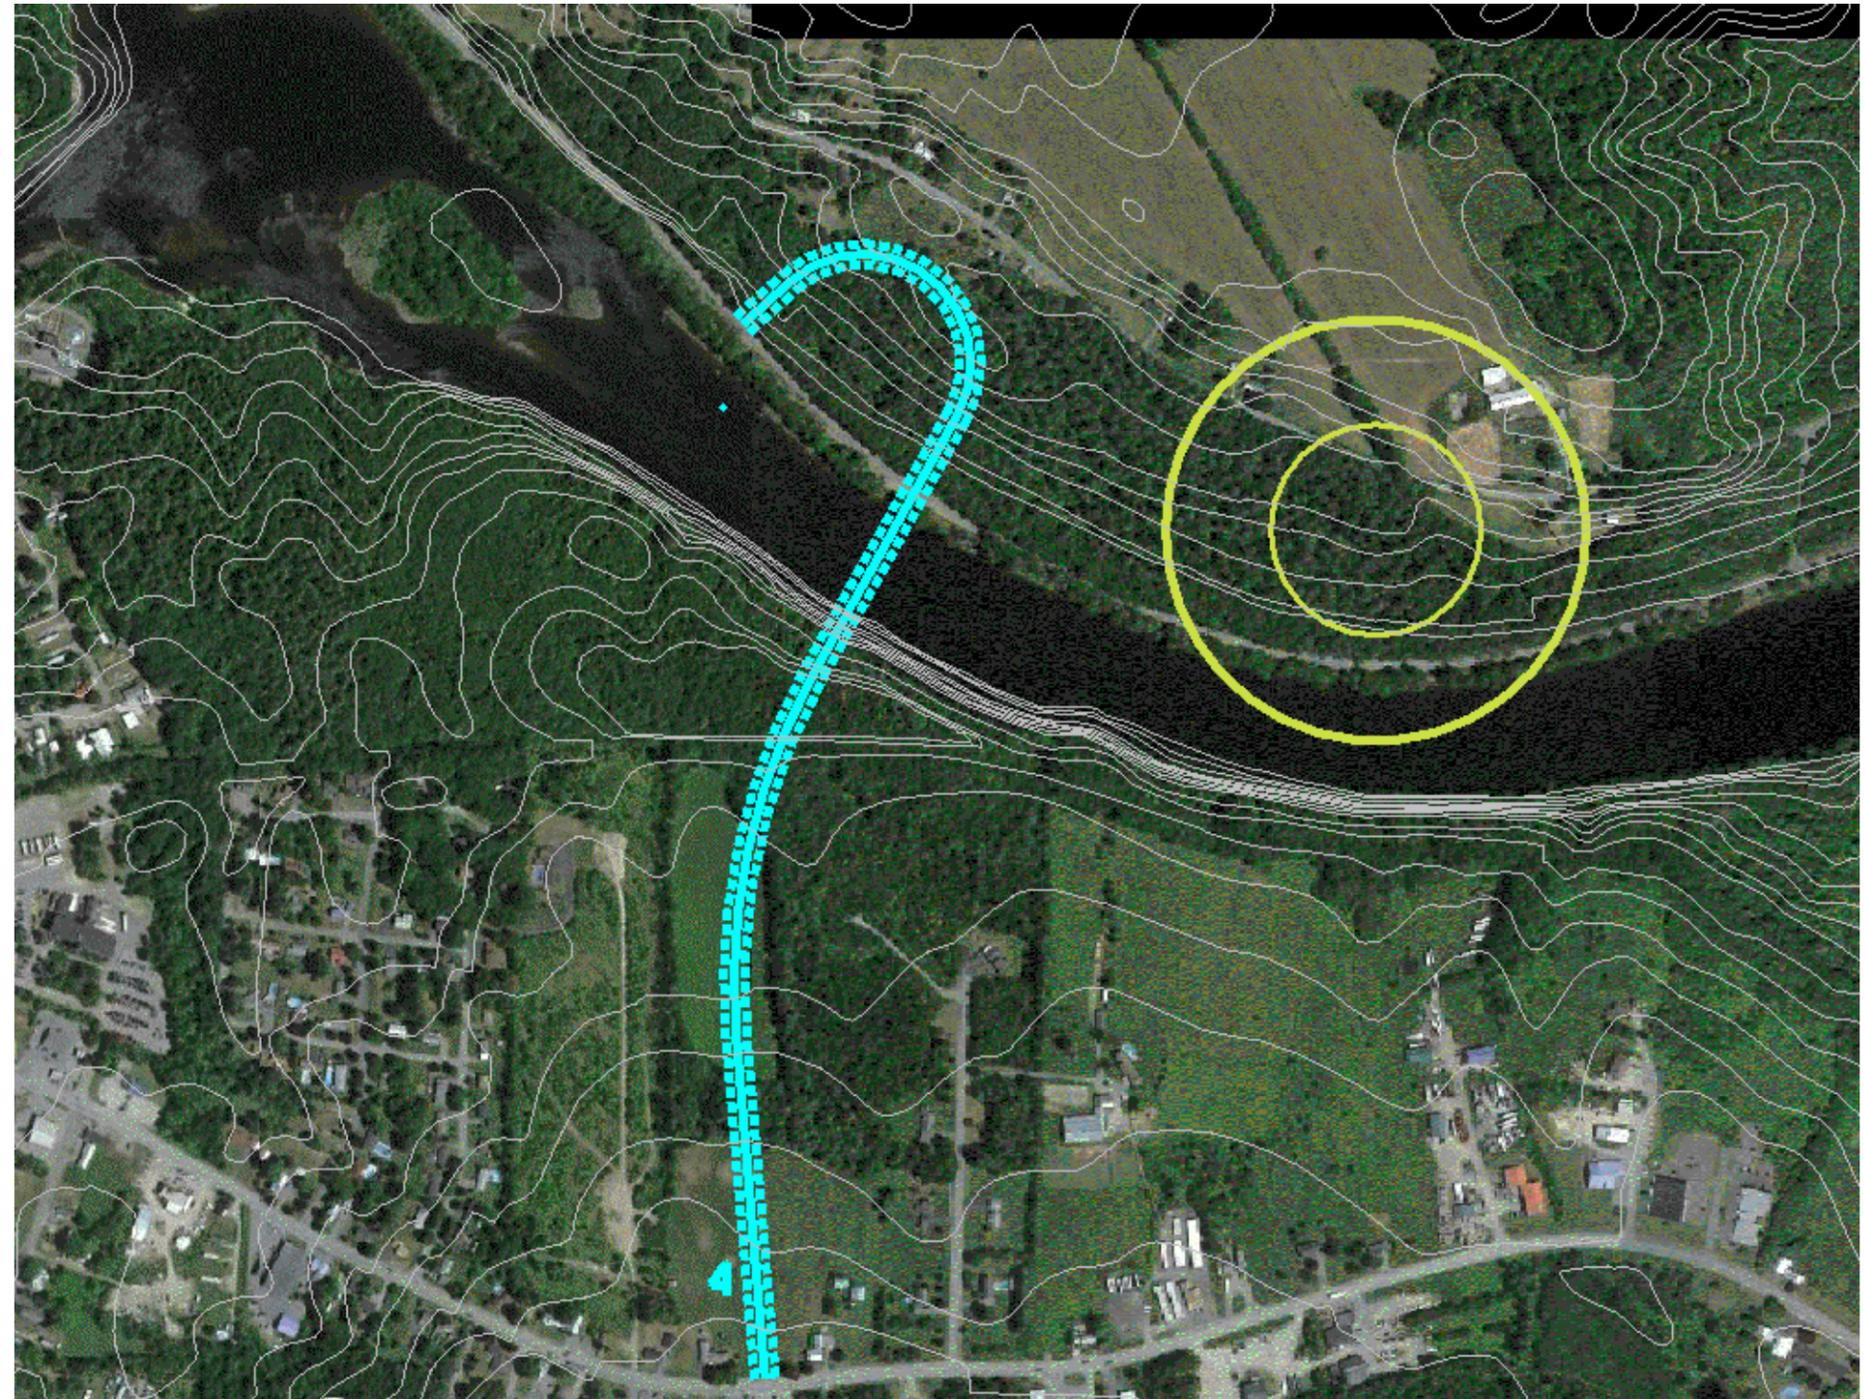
A4 Downstream Bridge Crossing Concept
